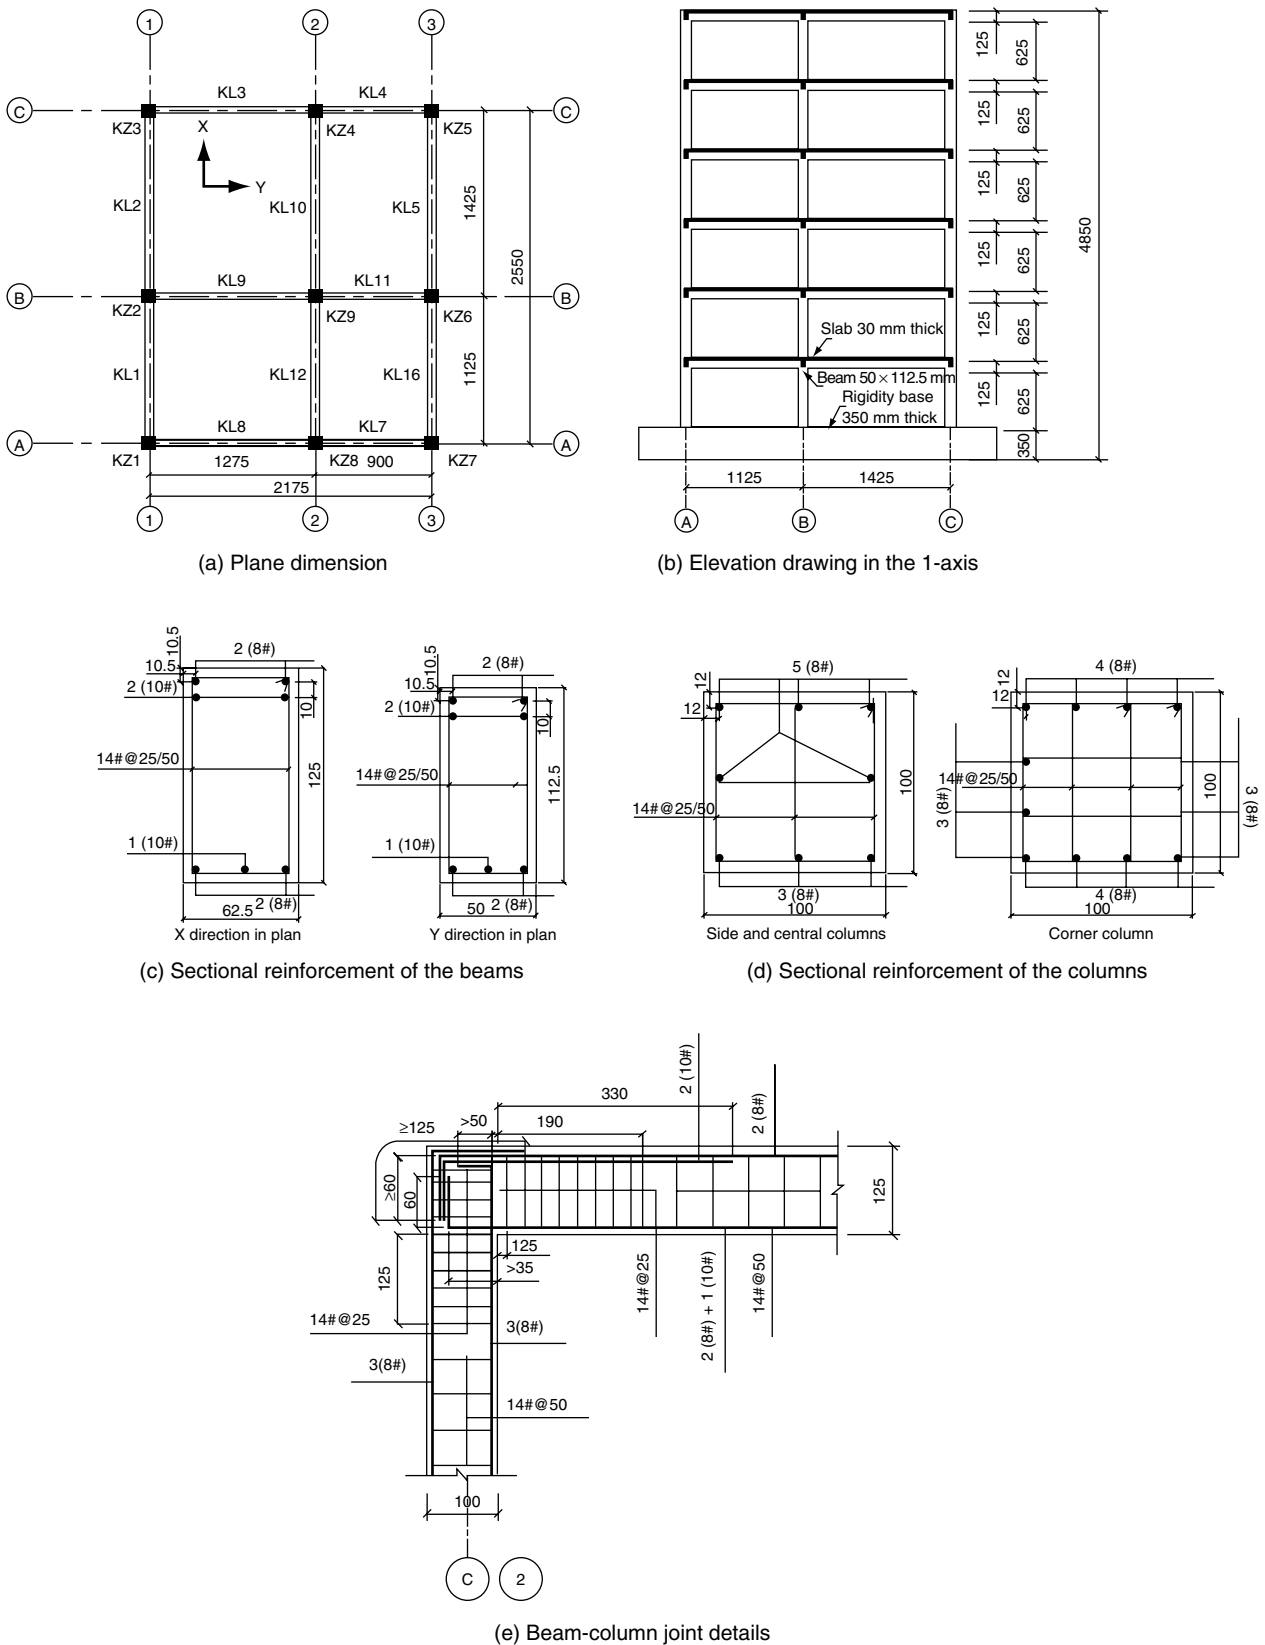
Configuration and reinforcement of space frame specimens (Unit: mm)
